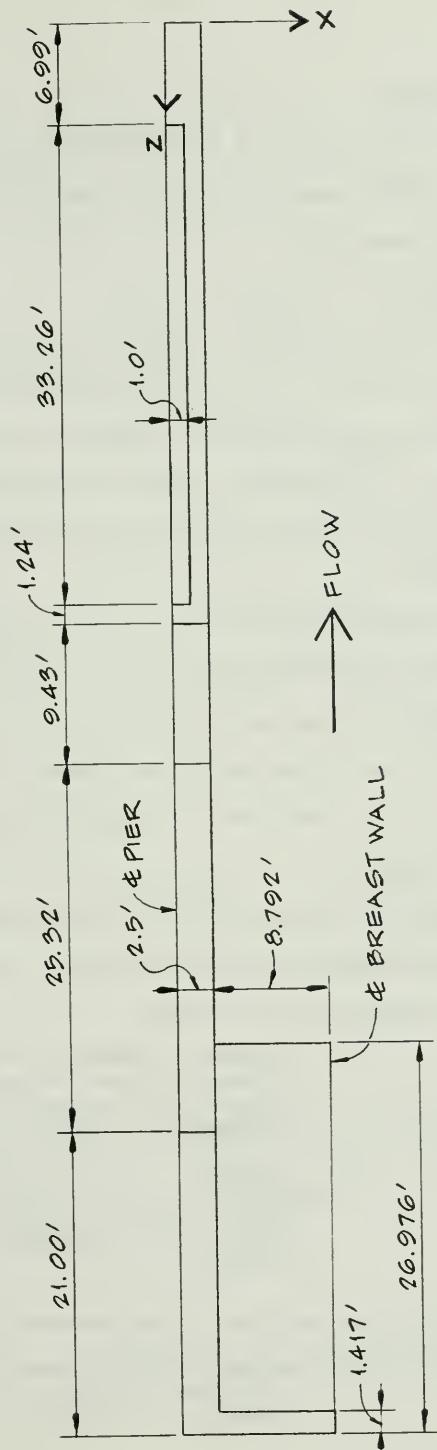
OROVILLE SPILLWAY STRUCTURE
